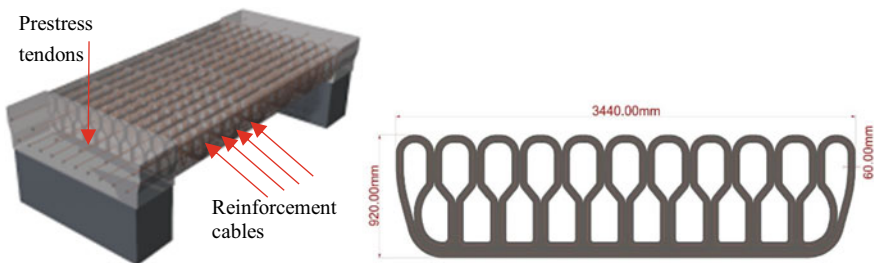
Schematic 3D image showing prestress tendons and reinforcement cable zones (left) and print element section geometry (right)
